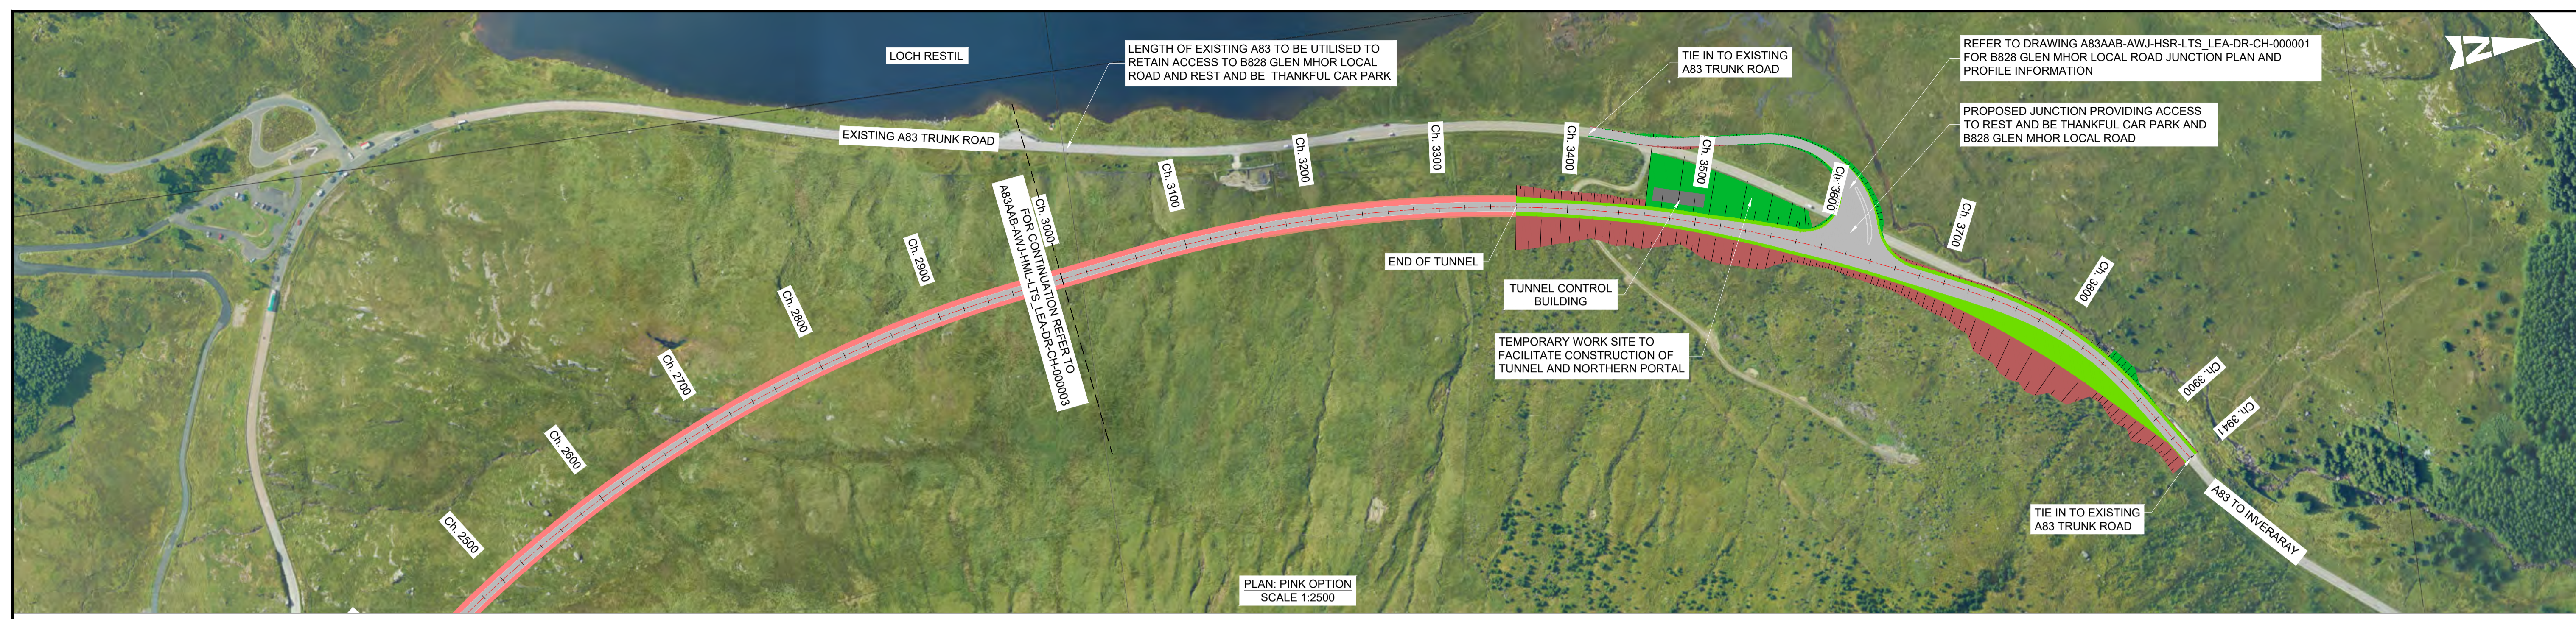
Drawing Number: A83AAB - AWJ - HML - LTS\_LEA - DR-CH-000003
